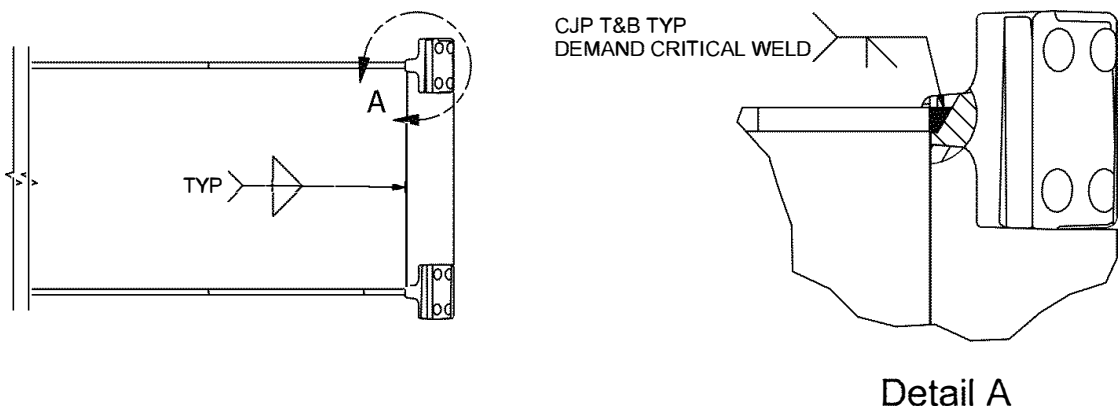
Collar-flange-assembly-to-beam welds, elevation.
